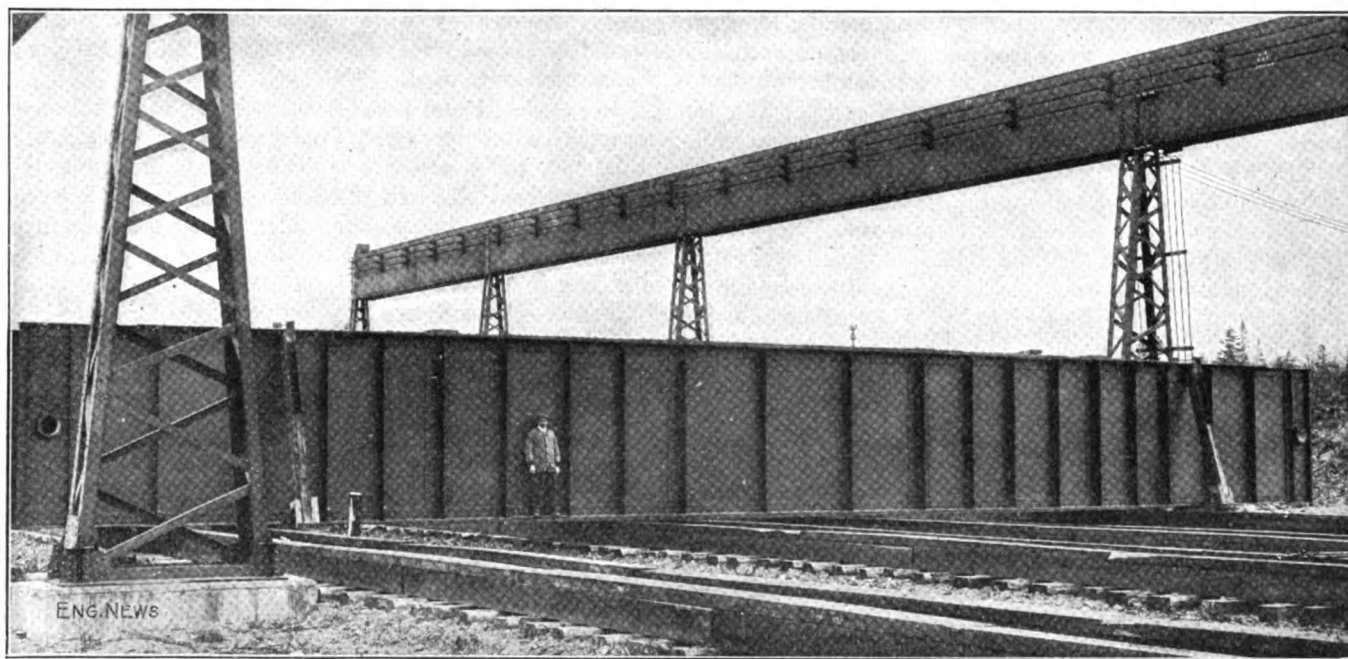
HALF OF ONE OF THE DOUBLE-WEB FLOOR-BEAMS OF QUEBEC BRIDGE
